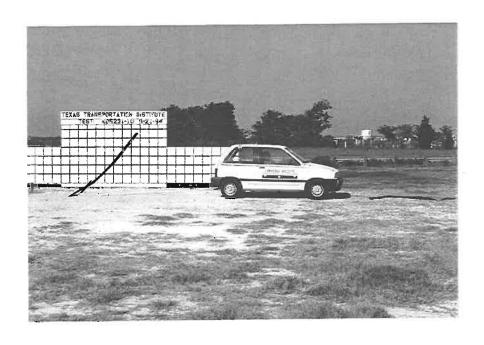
Final rest position of the sign installation and vehicle (test 405231-10). 108
